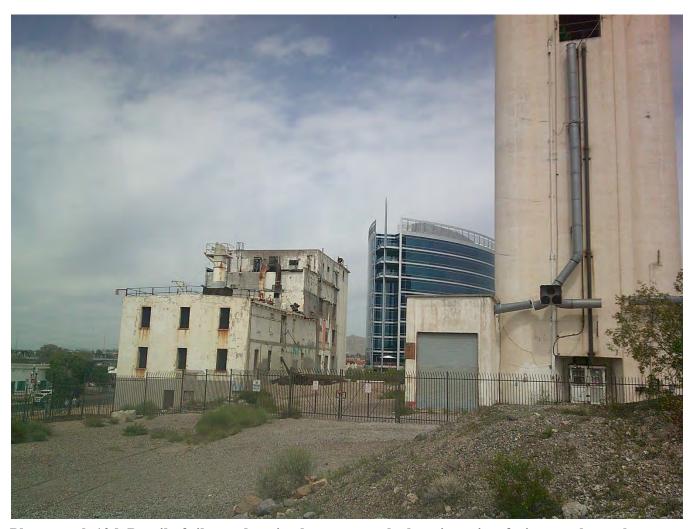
Overview of silos and grain elevators north elevation, view facing southeast (AZ_MaricopaCounty_HaydenFlourMill_010c)
